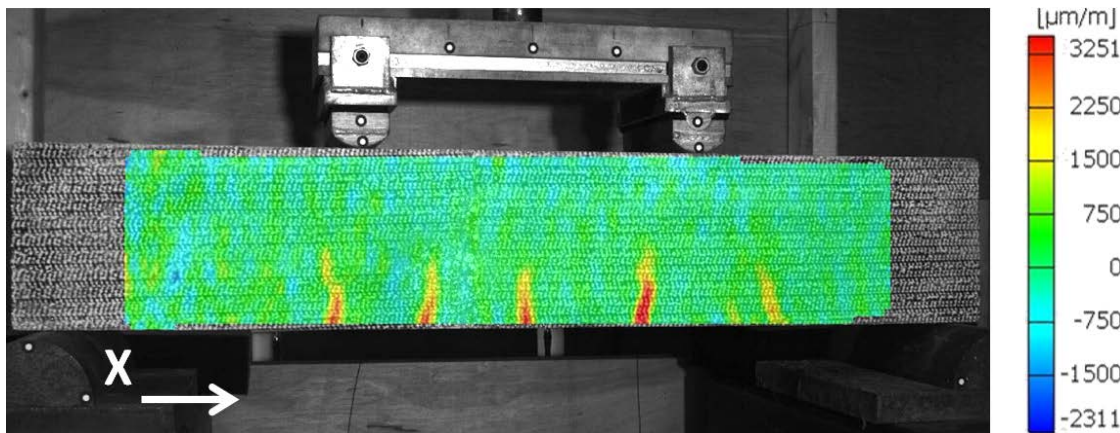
DIC strain/stress measurement of the RC beam (Second RC beam test)
